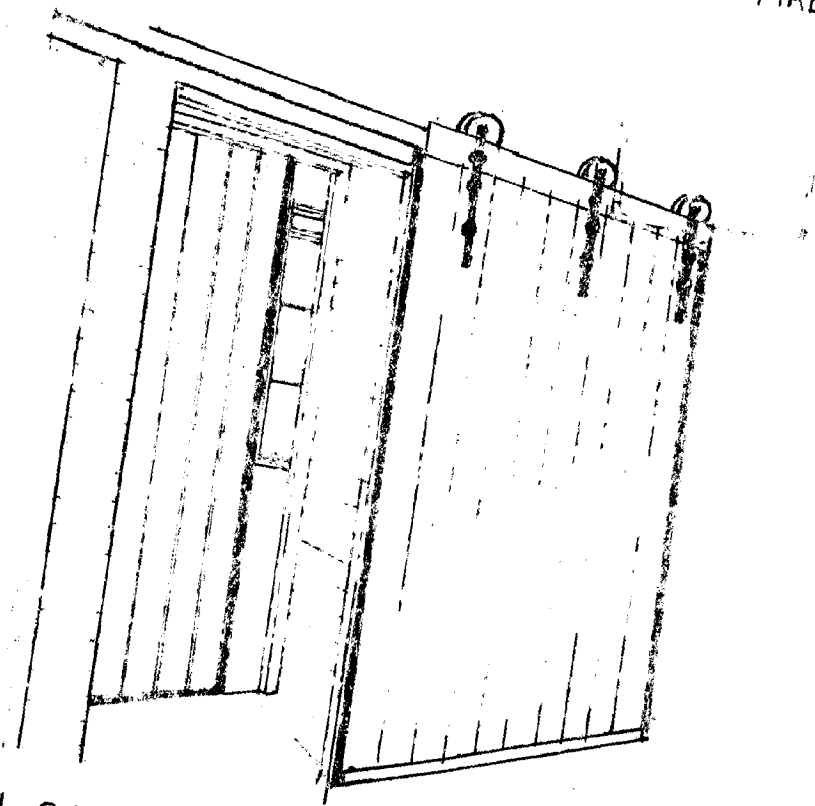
/B TYPICAL COMPOSITE FIRE DOOR.
